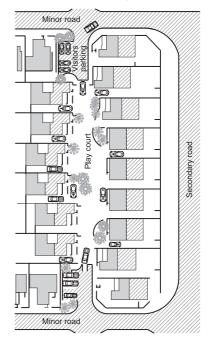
Conceptual diagram depicting the woonerf subdivision layout
